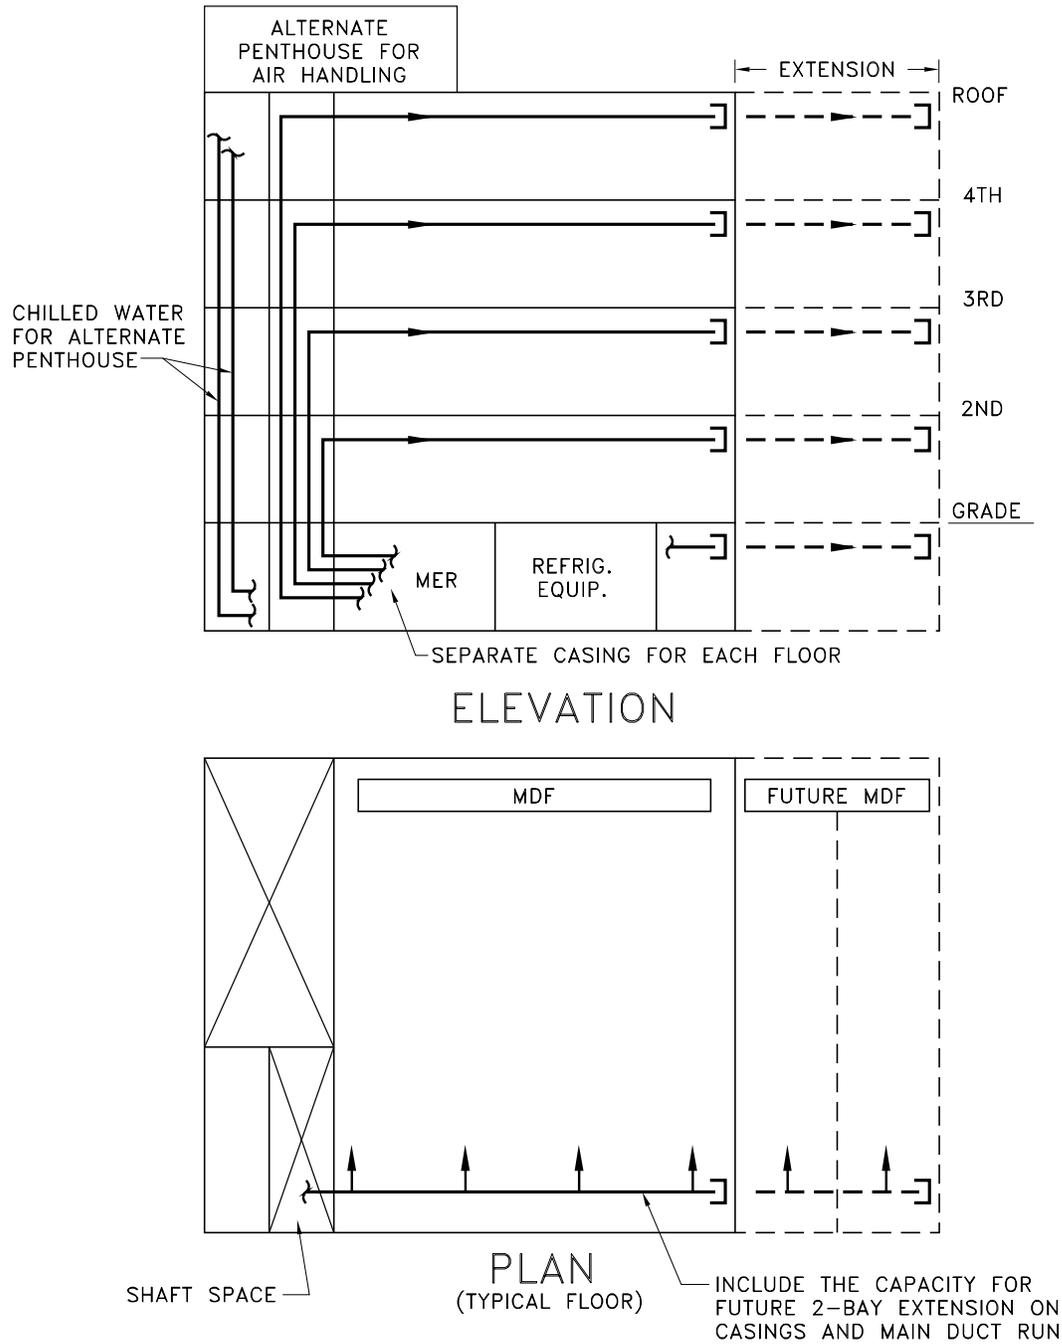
Preferred Location for MER in CO Equipment Building (4-Bay Extension) (Sheet 1 of 2)
